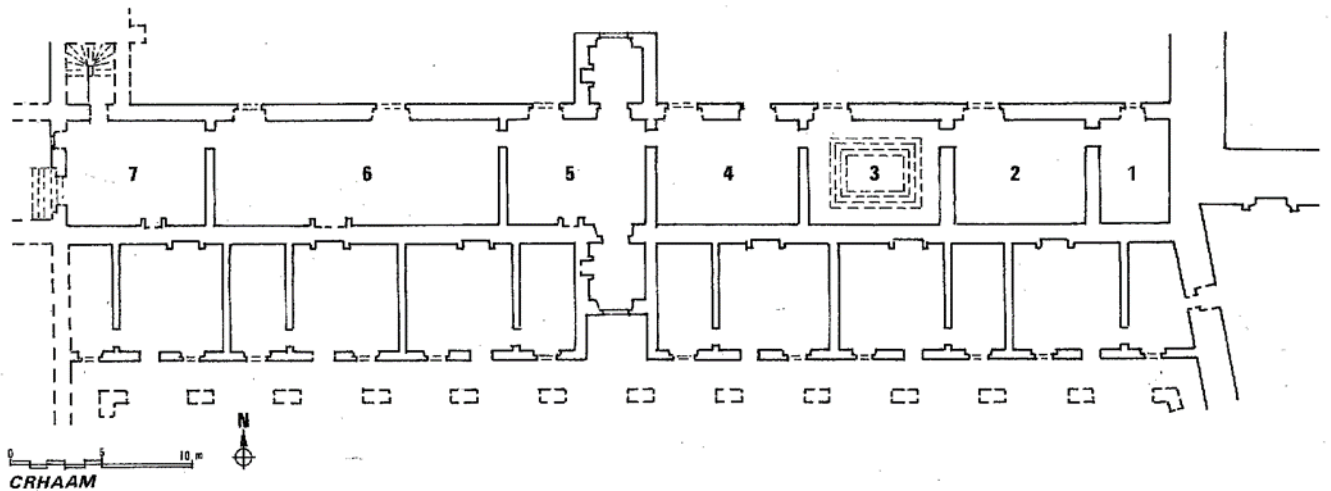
Layout of the Appartements des Bains, c. 1540. (reconstruction by J. Blécon)
